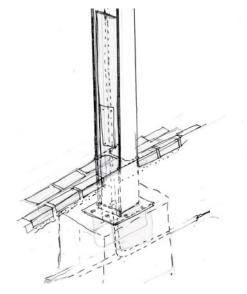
Inspection hole and conduit channeled behind 2mm steel flange welded to inside of H-Section. Scale: Not to scale (Author, 2008)
